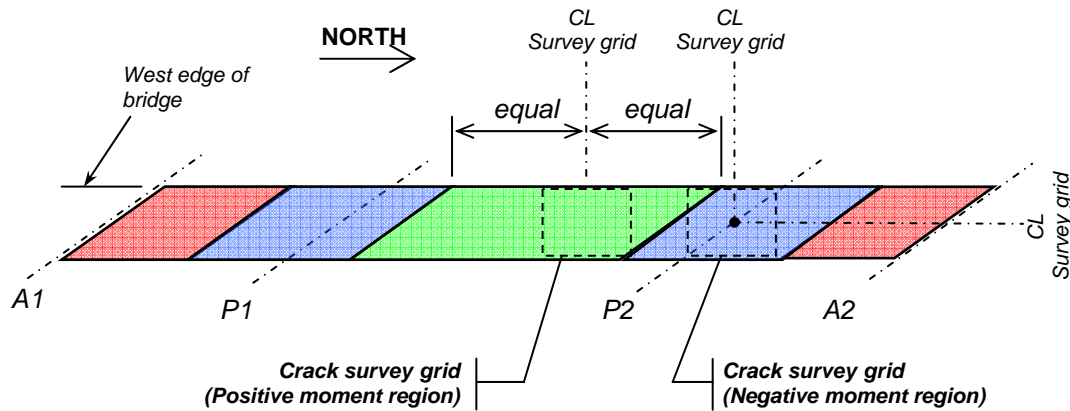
Location plan of the two crack survey grids of the Stage 4 deck
